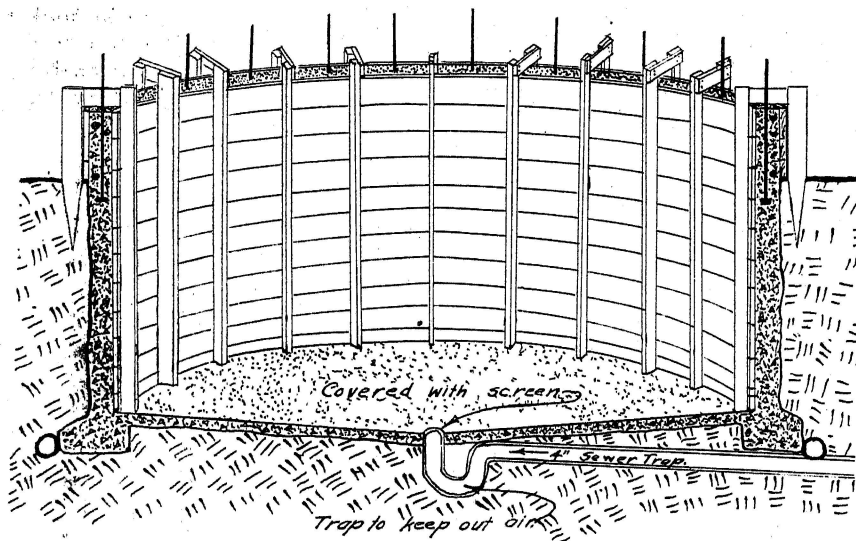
Detail of pit, wall, footing, drain and trap in foundation for silo.
